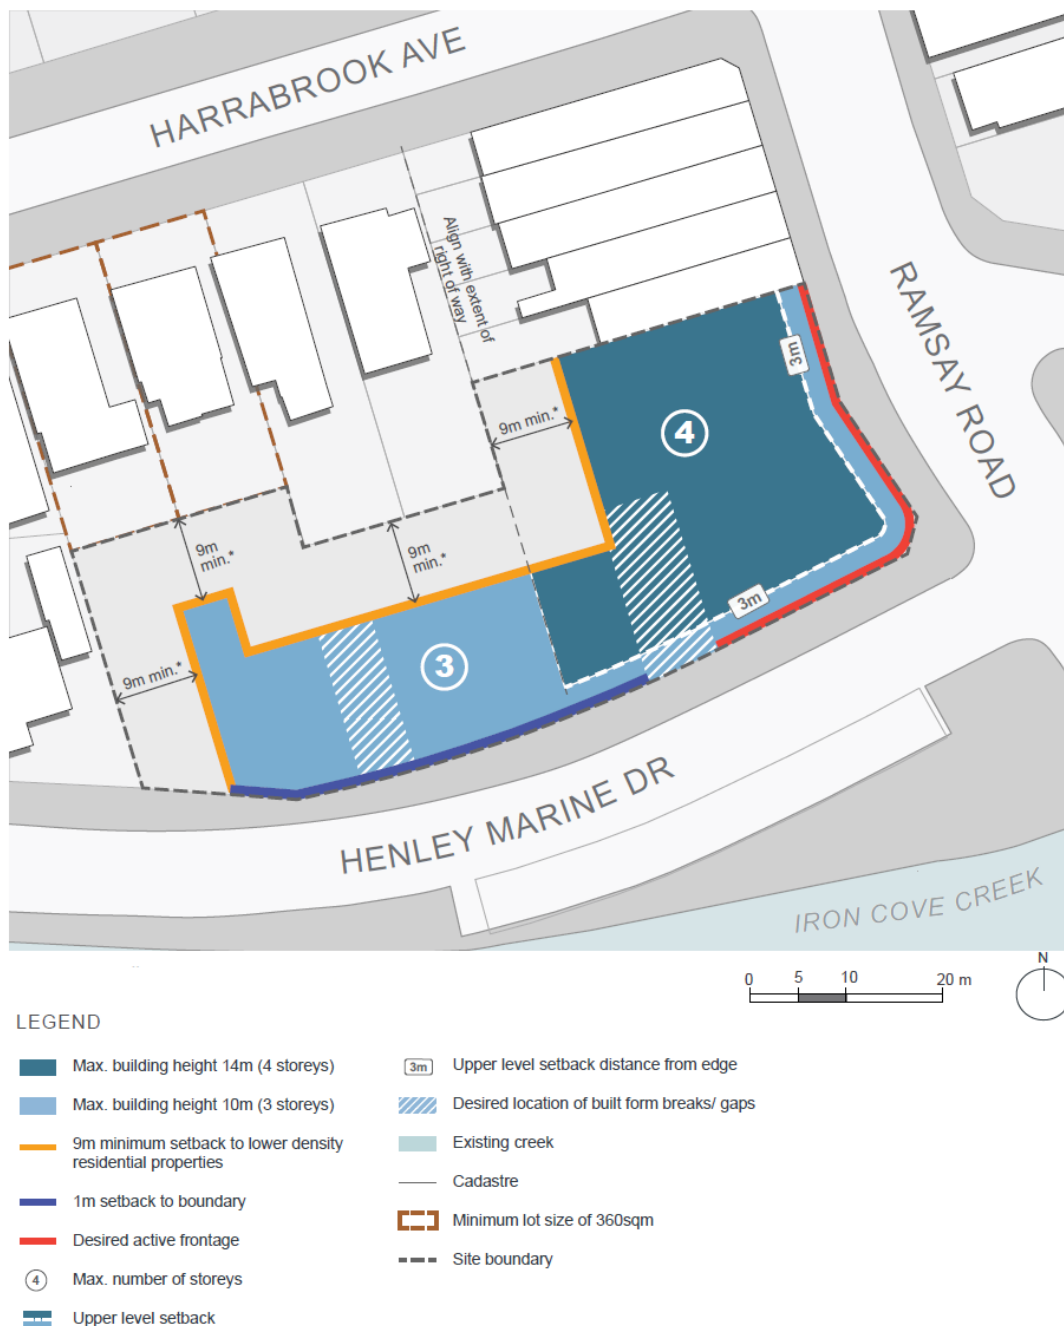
Recommended Building Envelope Plan (Source: Draft DCP)
